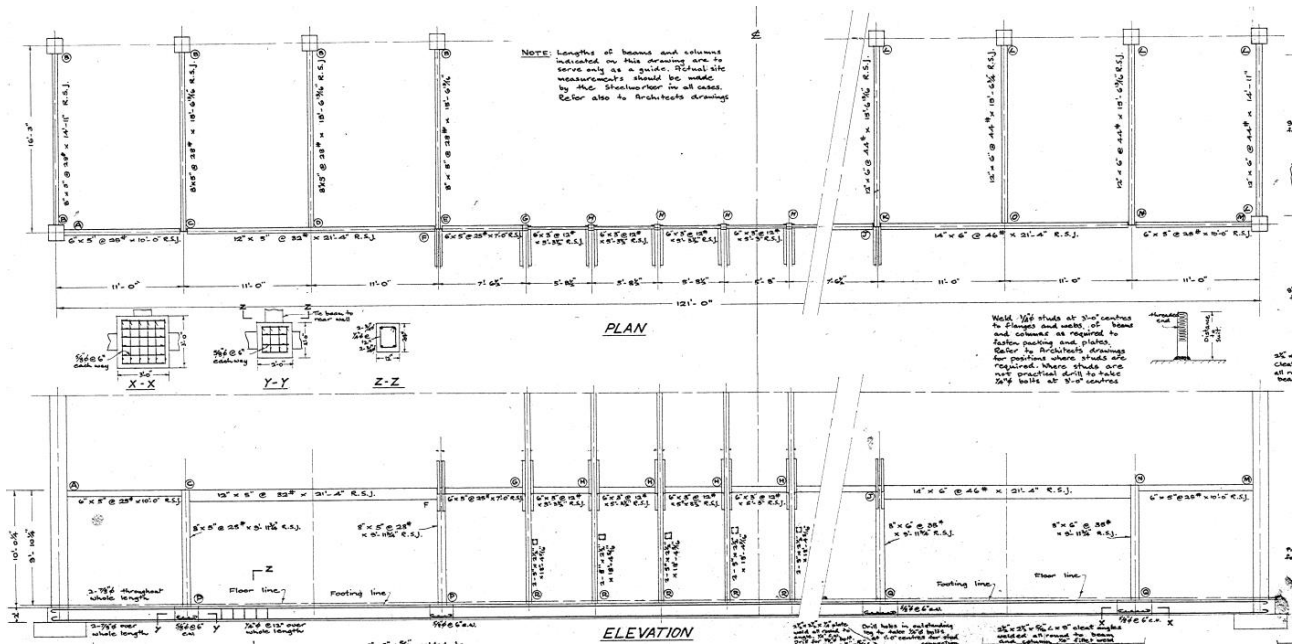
Original Mezzanine Area Steel Structure Plan and Elevation Respectively
